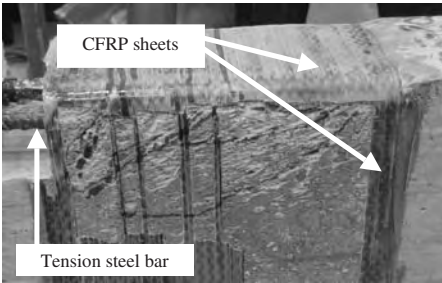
Longitudinal cracks under CFRP sheets in set 2 (beam upside down).
